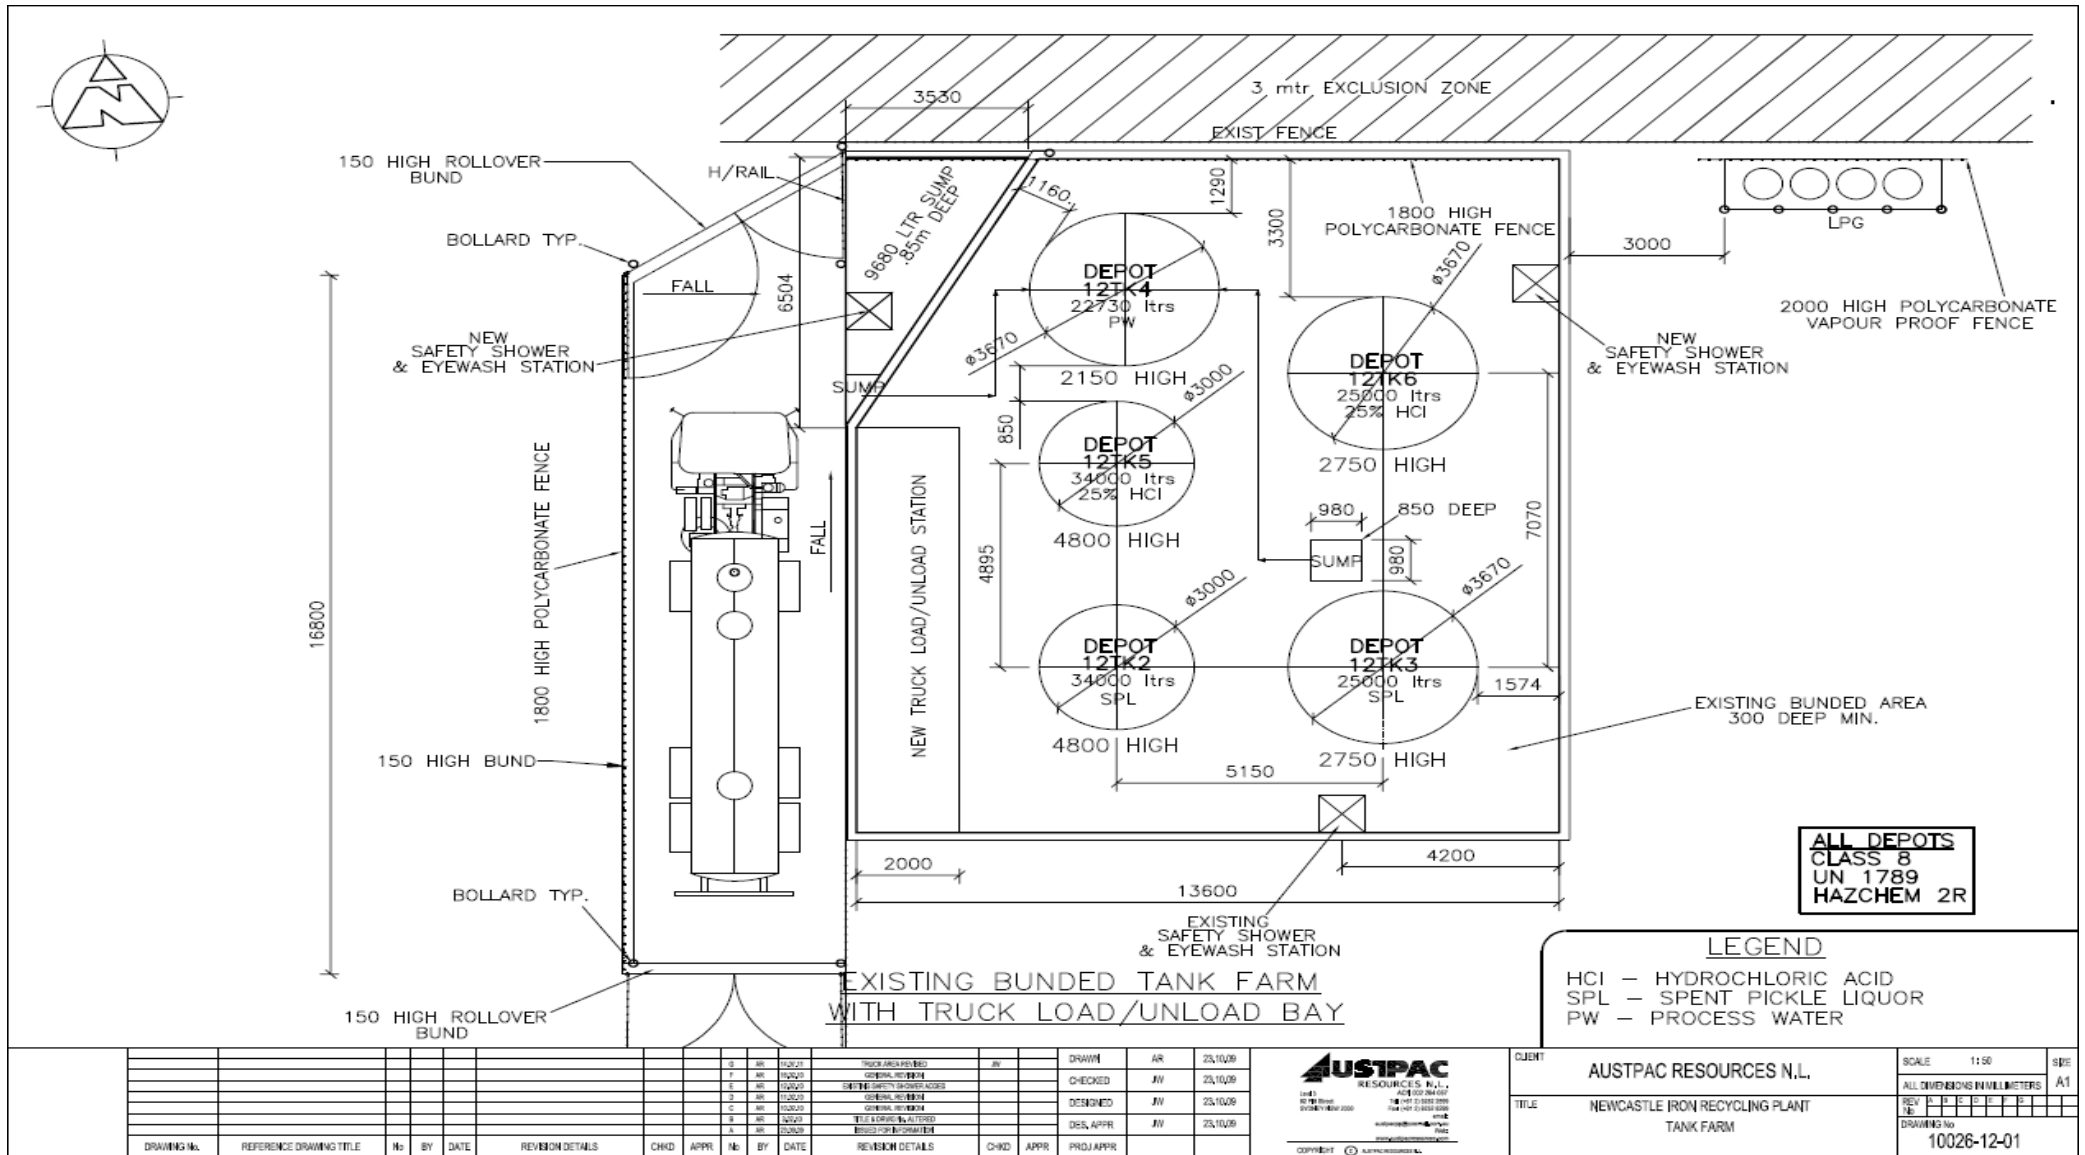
Layout of NIRP Tank Farm and Truck Loading Bay
